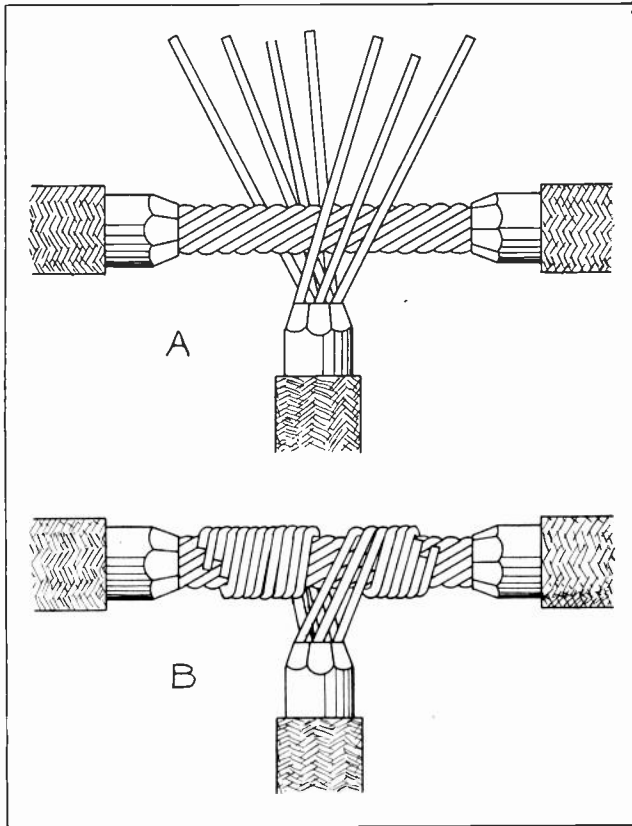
Method of making a "tap" splice with stranded cables. Note how the wires of the "tap" cable are divided and each group wrapped in opposite directions around the "running" cable.
